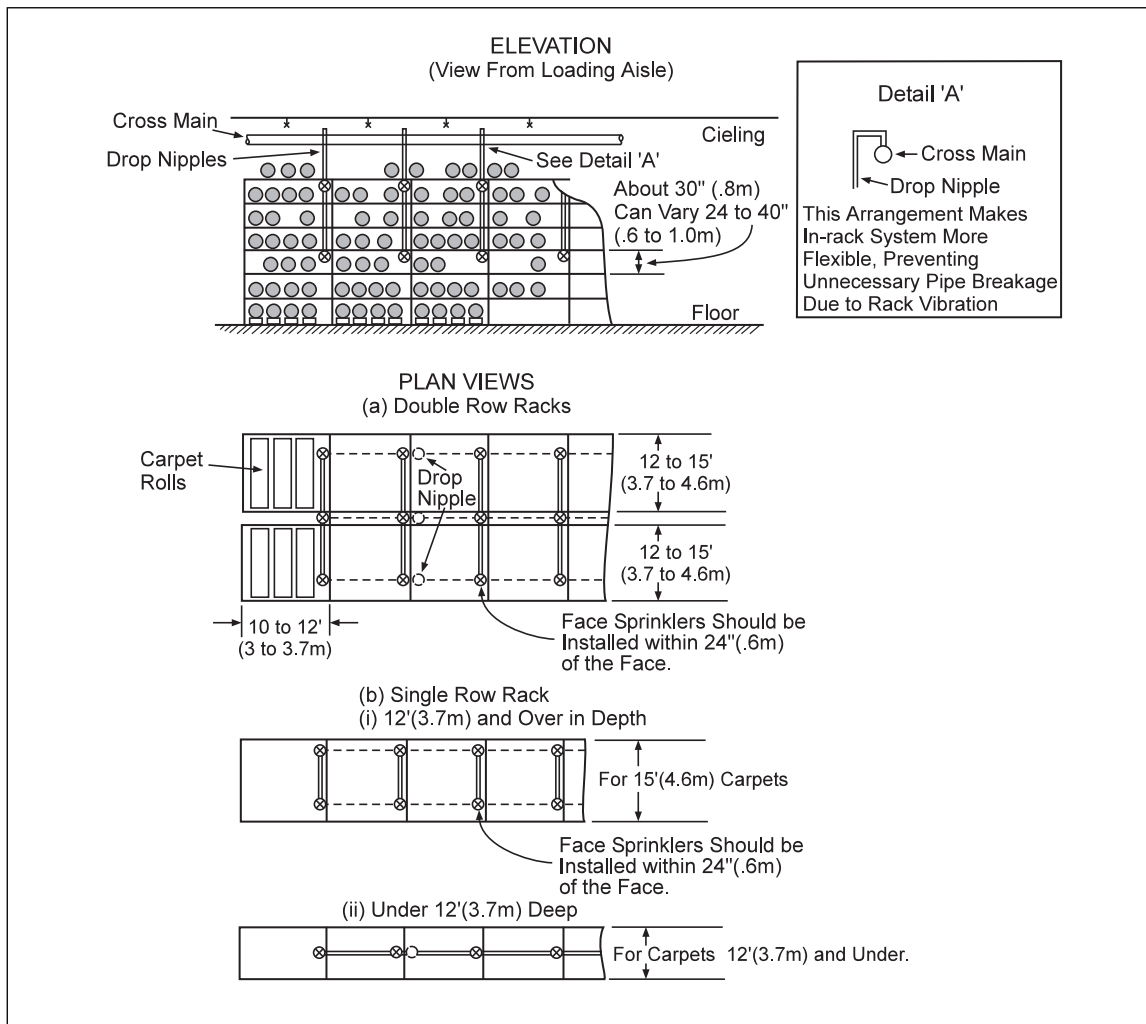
Typical in-rack sprinkler installation for carpet racks. Note: Instead of one drop nipple at every upright, 1 to 3 drop nipples per rack can be used with in-rack sprinklers connected by pipes as indicated by dotted lines only
